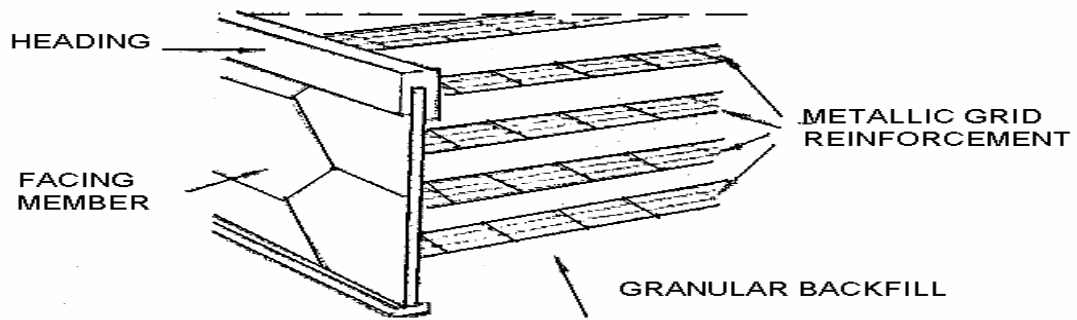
Metallic grid reinforcement application in a reinforced earth system
